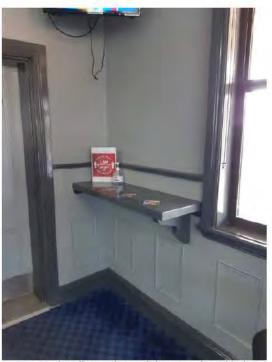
| Wall panneling and skirting in the public bar, Lewis Street frontage.
